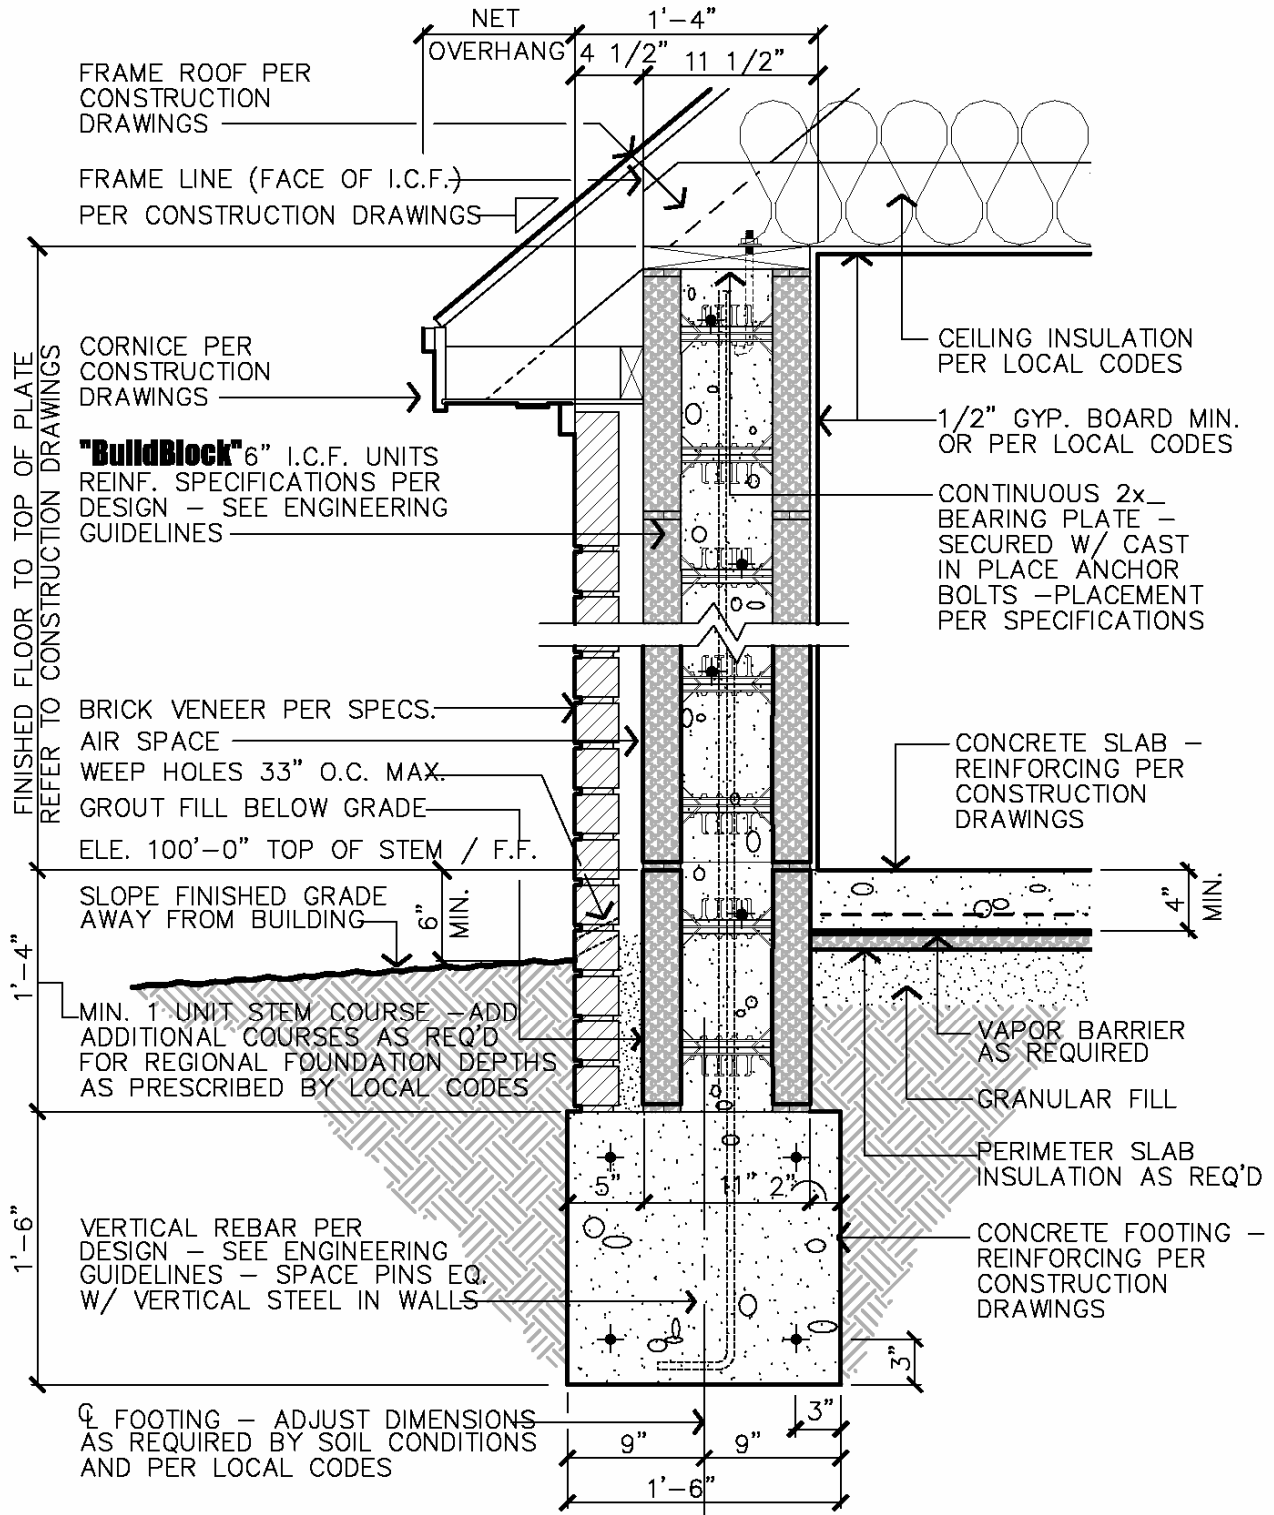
BUILDBLOCK® SINGLE STORY WALL DETAIL
